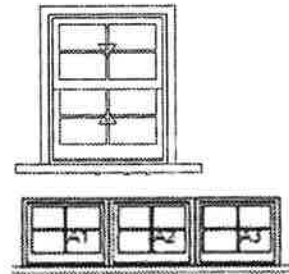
Proposed laundry room window type (above) and proposed master bedroom window type (below) for the west elevation of the new addition.
